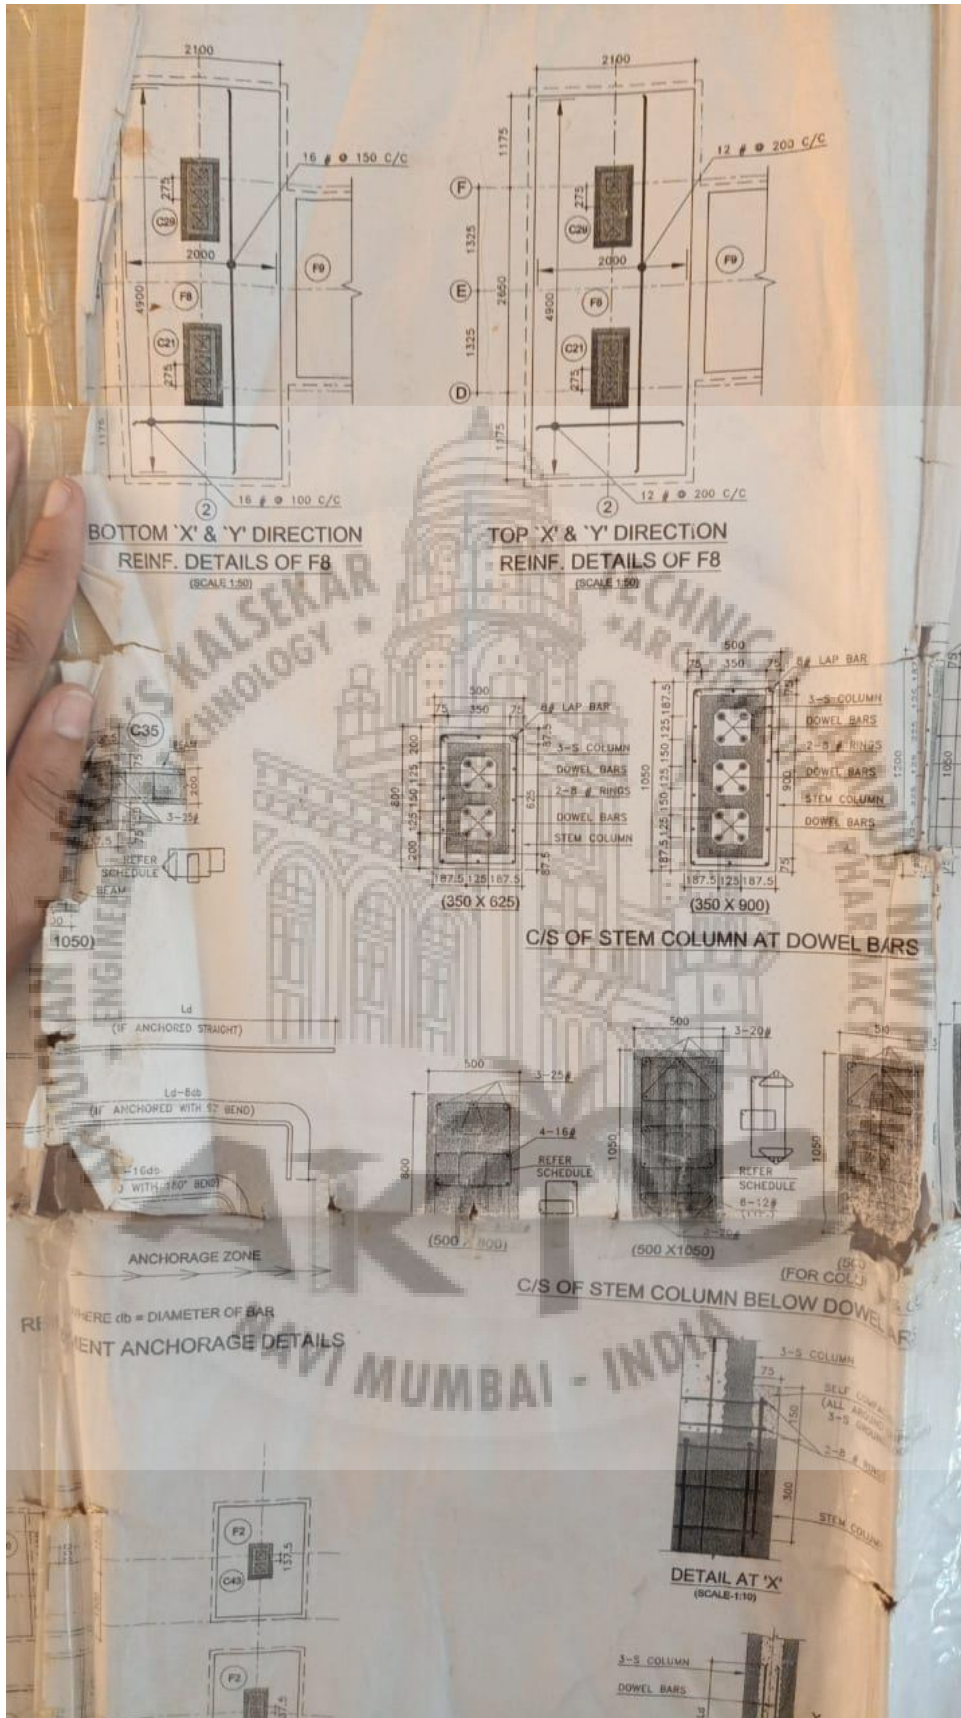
(i) : Cross Section Of Column (Sector 36-1)
